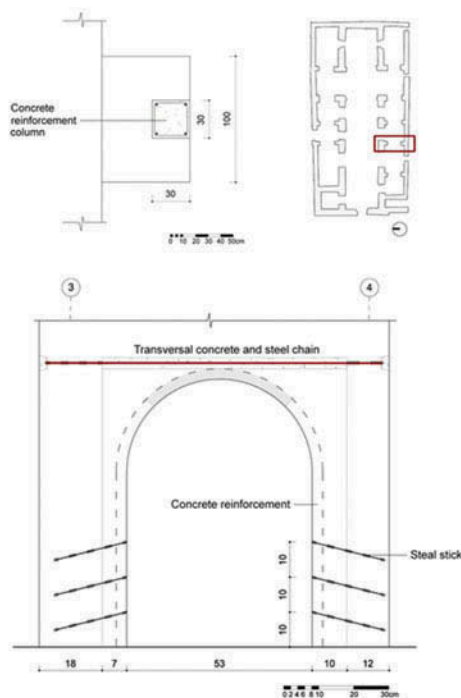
Reinforced Concrete frame reinforcements of transverse arcades walls, 1988 (Plans based on—).
